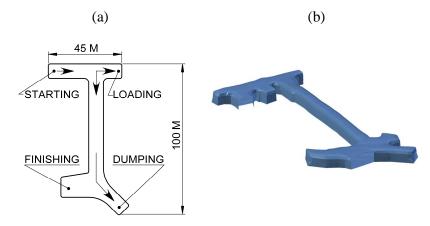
Virtual mining tunnel: (a) Route of the testing task, (b) 3D view of the tunnel
